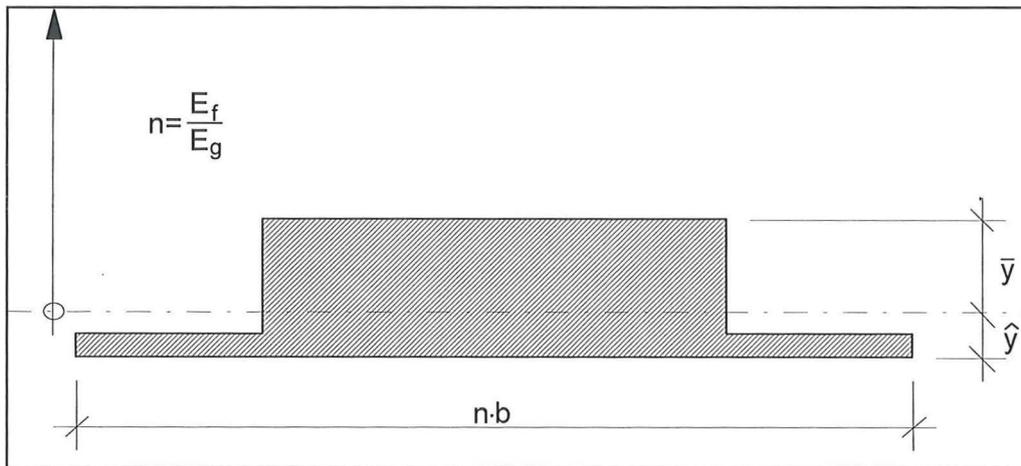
Cross section of the specimen when the fiber-glass is transformed to wood
